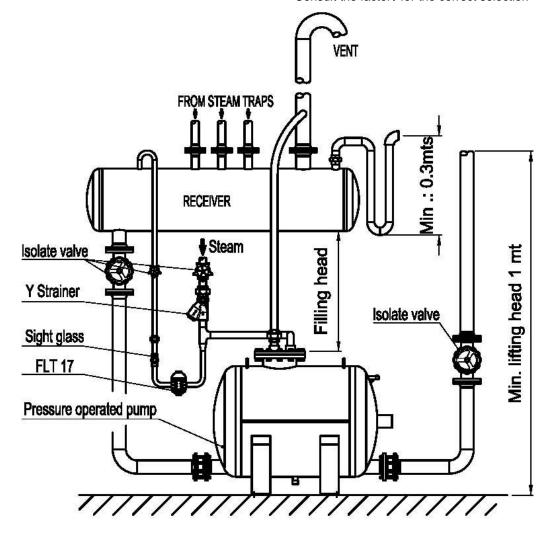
shows a typical example of installation of ADCAMAT automatic pump. For further details and instructions please contact the factory or our distributor.
